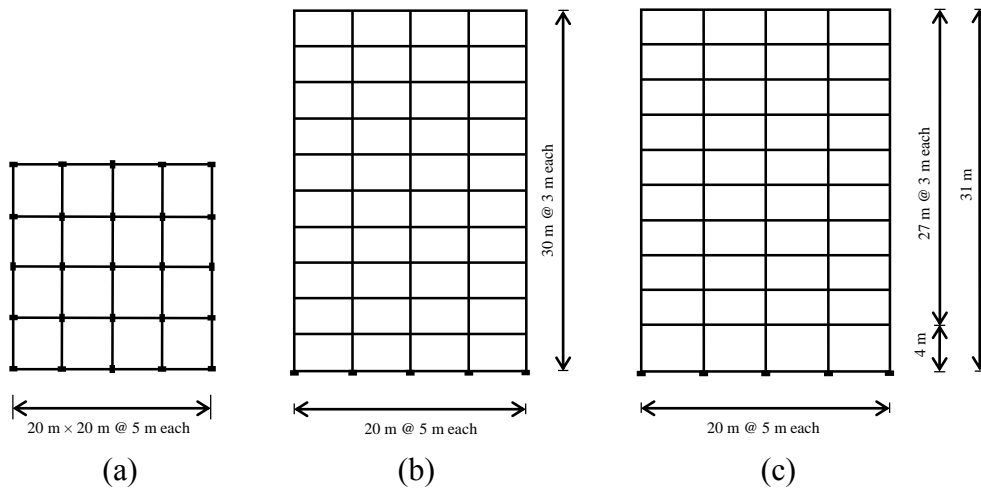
Plan and elevation details; (a) Plan of regular and irregular structures; (b) Elevation of regular structure; (c) Elevation of irregular structure
